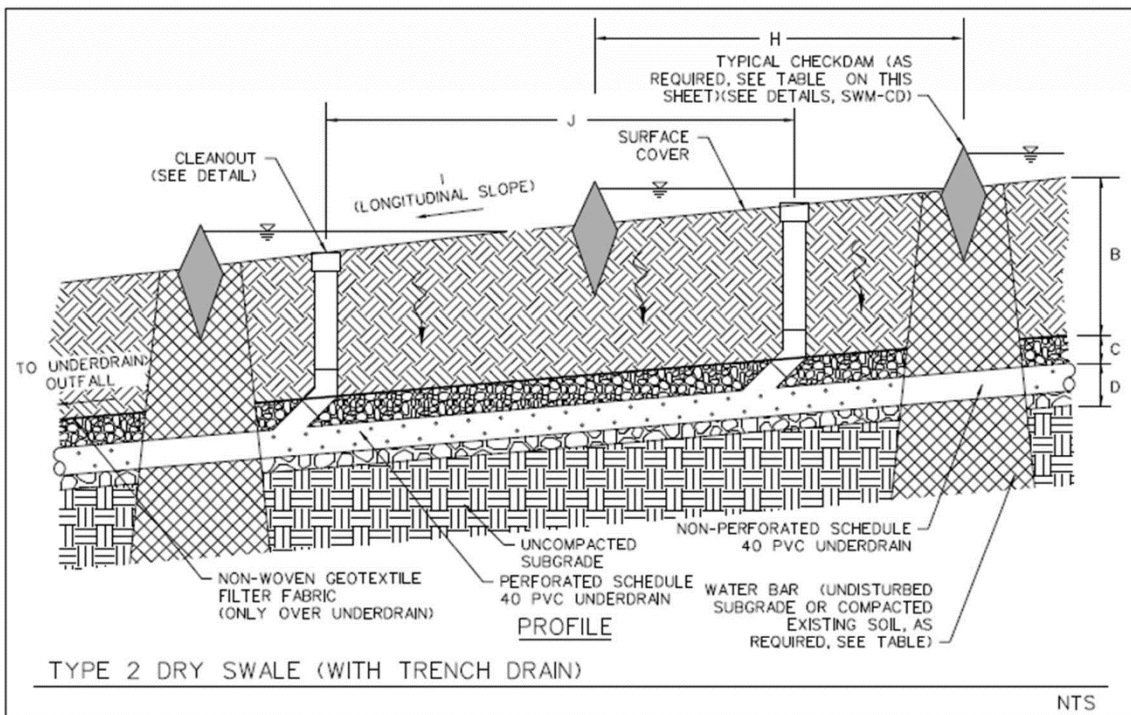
Typical Dry Swale – Level 1 [Profile View]
